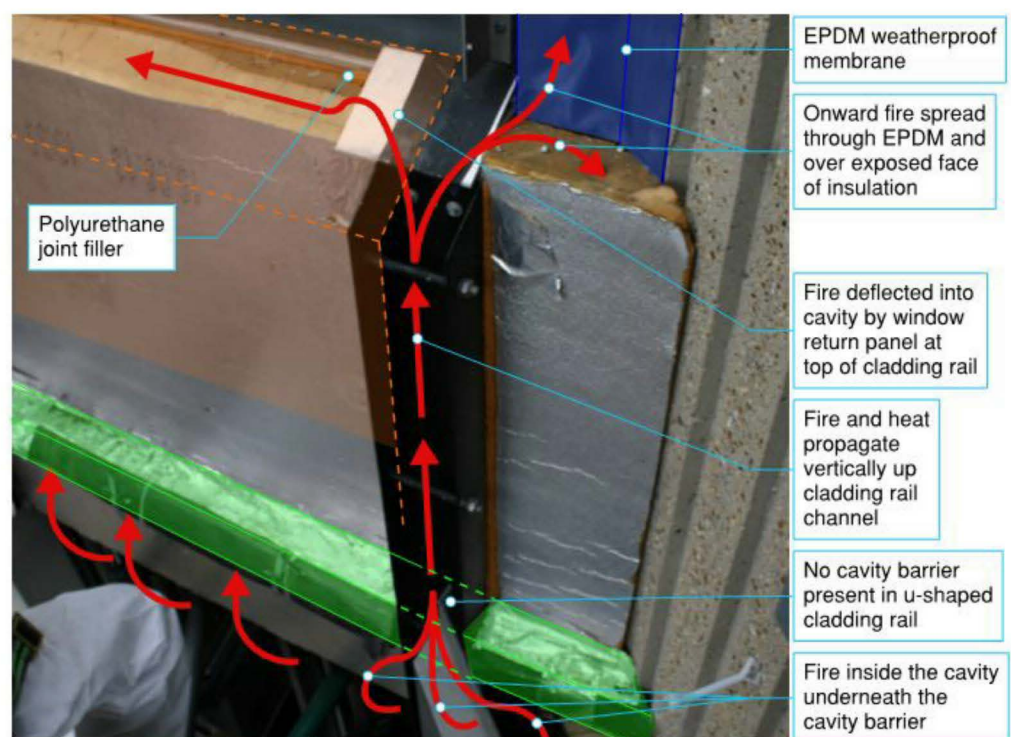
Schematic of possible fire spread via cladding support rail (External Flat 14)
